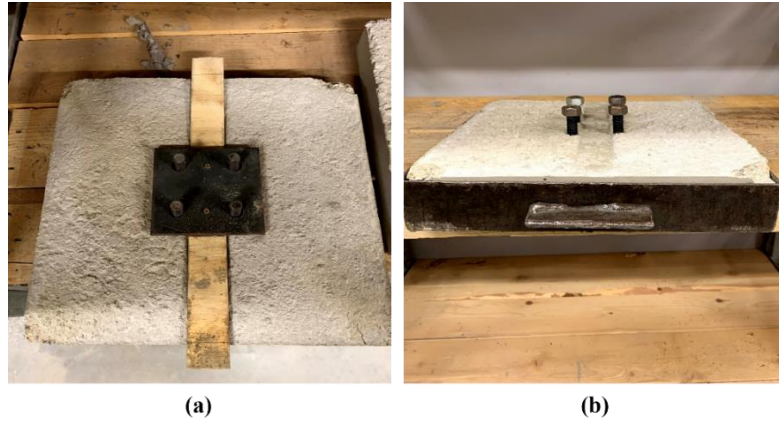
Concrete targets with bolts cast in-situ – (a) Top view (b) Front view
